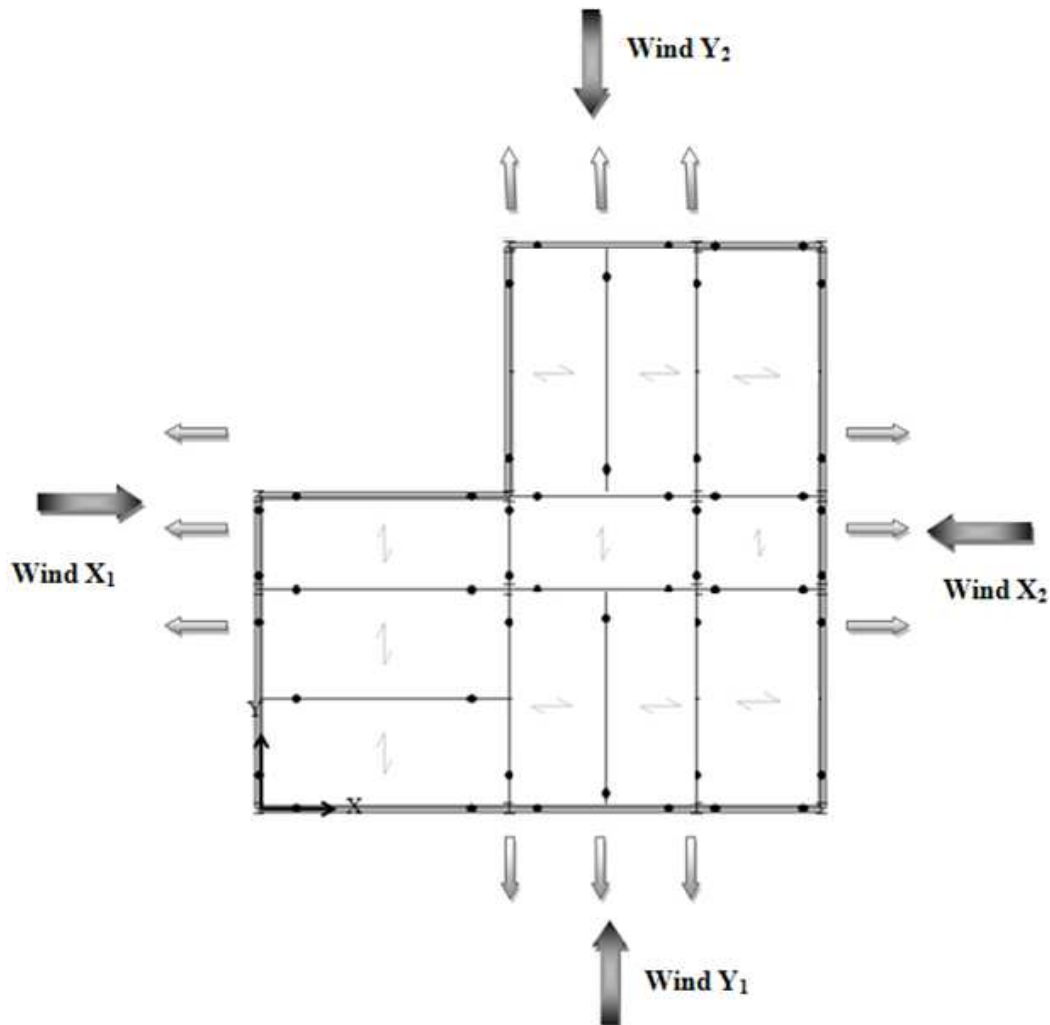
Simple frames with pinned connections and direction of winds for asymmetrical plan and symmetrical section.
